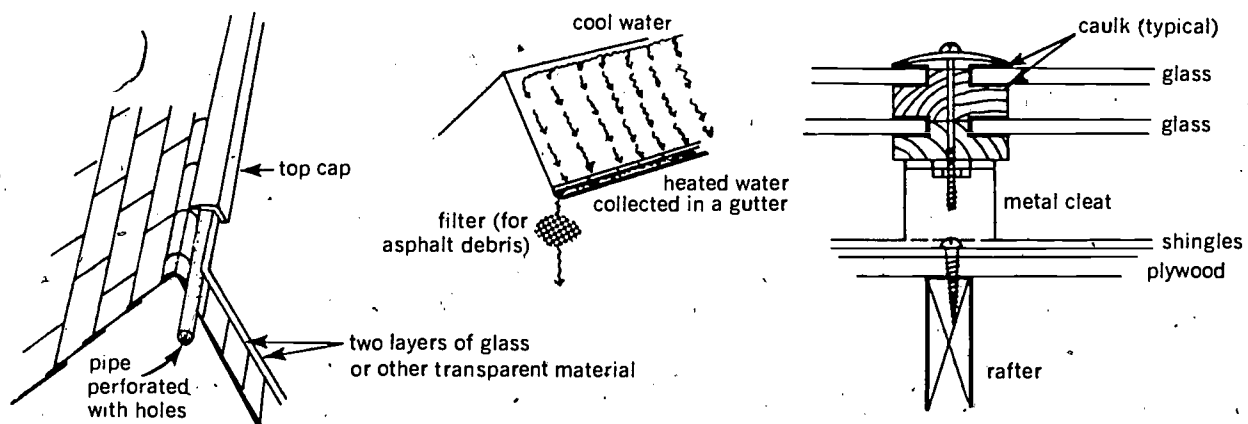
Converting an existing roof to an open flow water-type solar collector.
